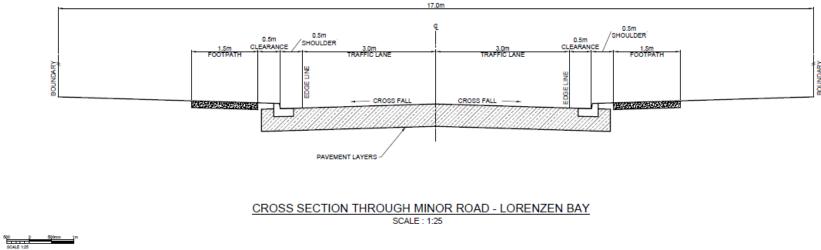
Lorenzen Bay Structure Plan - road cross sections
